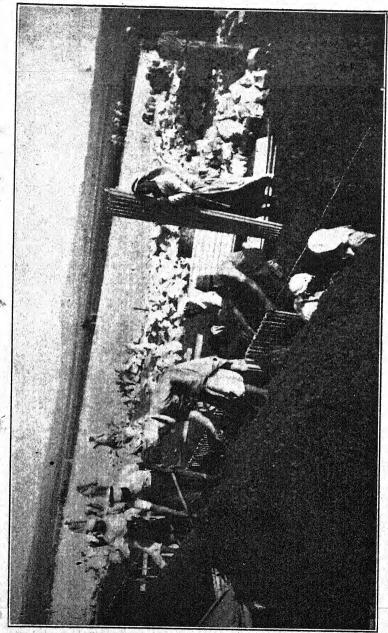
C.G.I. SHEETING TO CHECK INGRESS OF SUBSOIL WATER BELOW SOLED MACADAM RUNWAY
